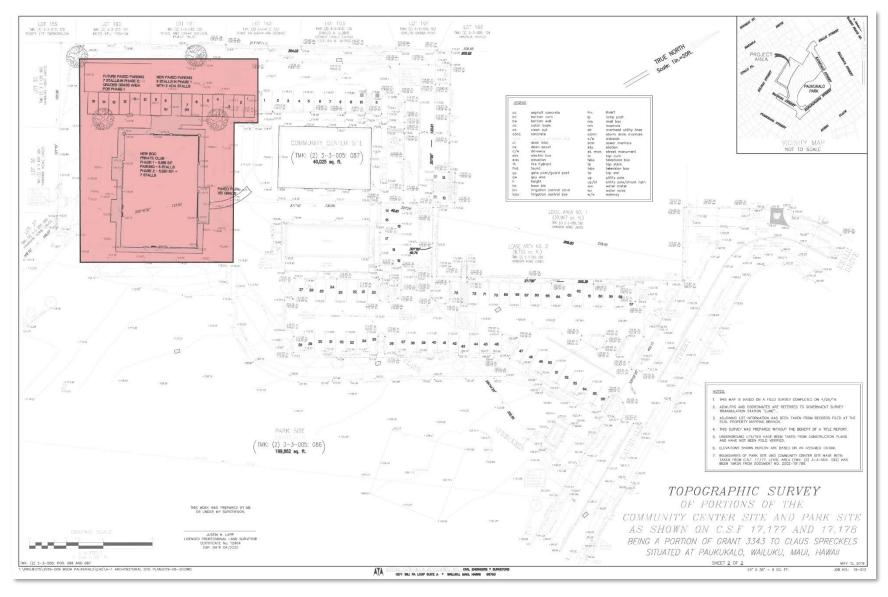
Location of the current outdoor play court and proposed additional parking areas (highlighted in red) (plan courtesy of Munekiyo Hiraga)
